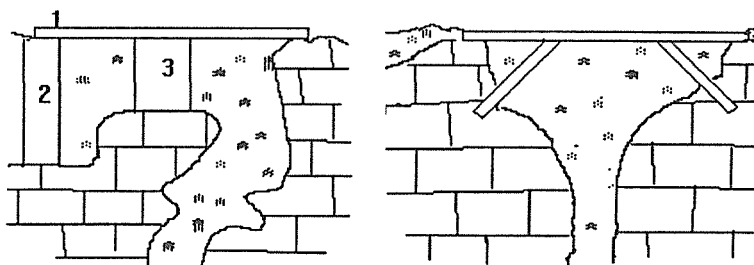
Spanning methods. 1.simple beam; 2.deep converted caisson; 3.pier-type foundation.
